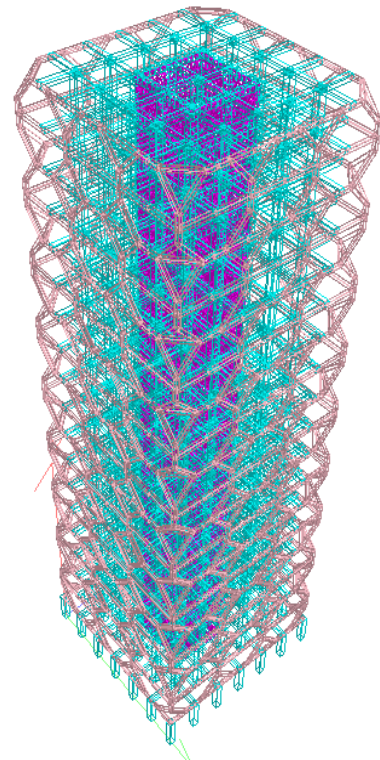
Wireframe view of shear wall+6m Octagrid module building
